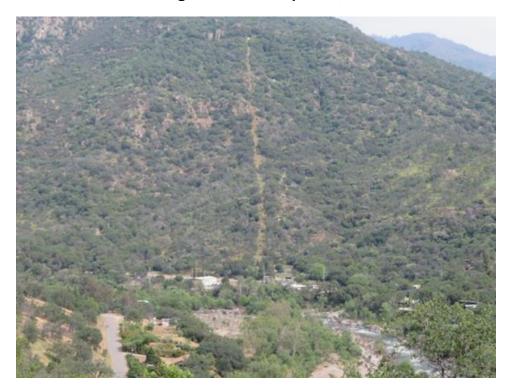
Kaweah No. 1 forebay, penstock alignment and powerhouse as viewed from Dinely Road. The Kaweah River is in the foreground. Camera facing southeast. May 8, 2018.
